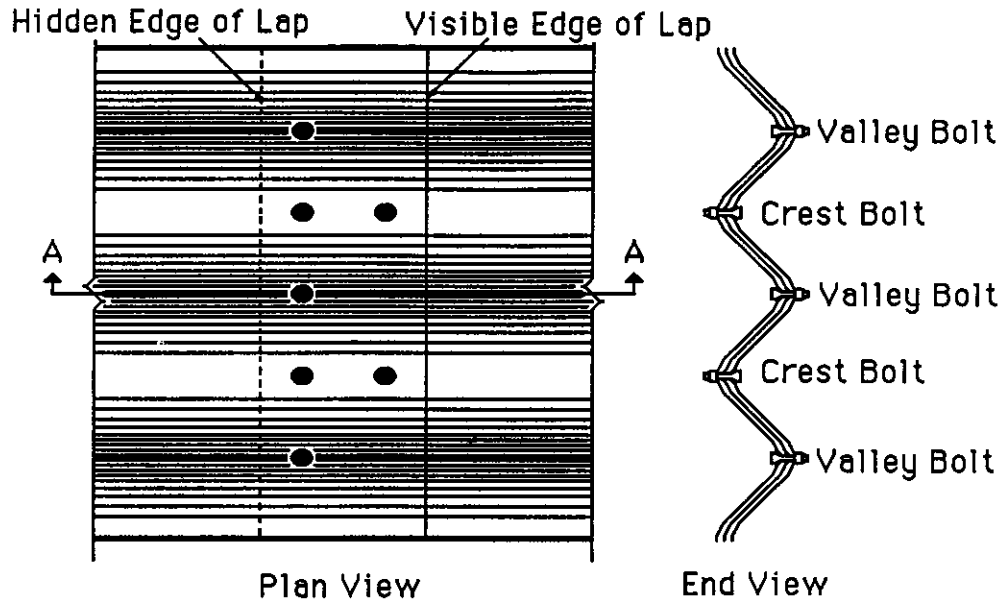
Bolting Arrangement for Specimen 7I3MC
